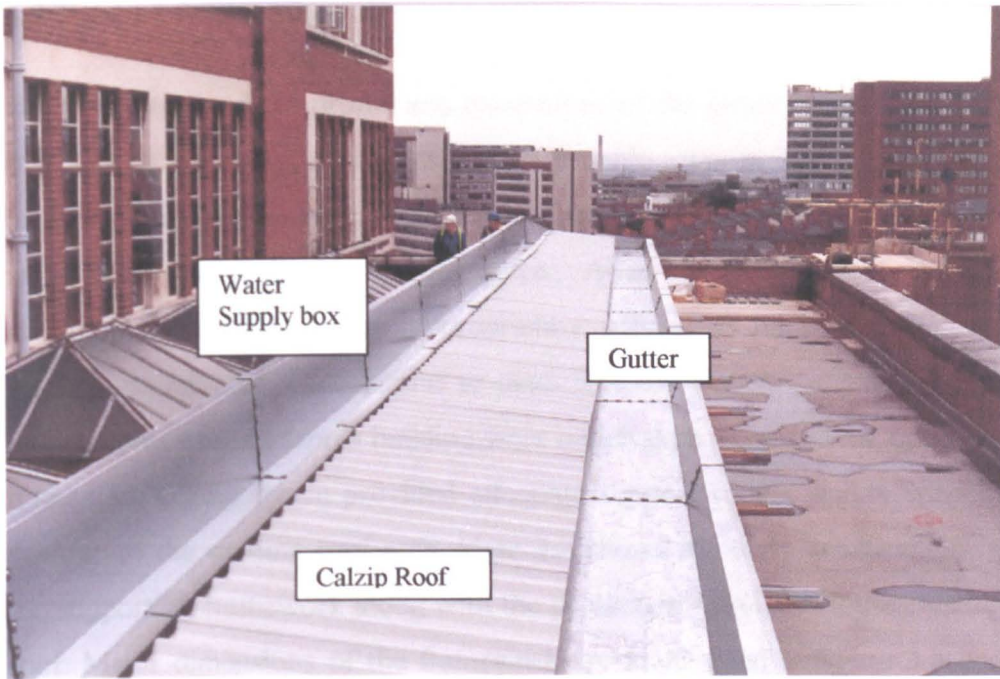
Configuration of Supply Box, Roof Section and Gutter
